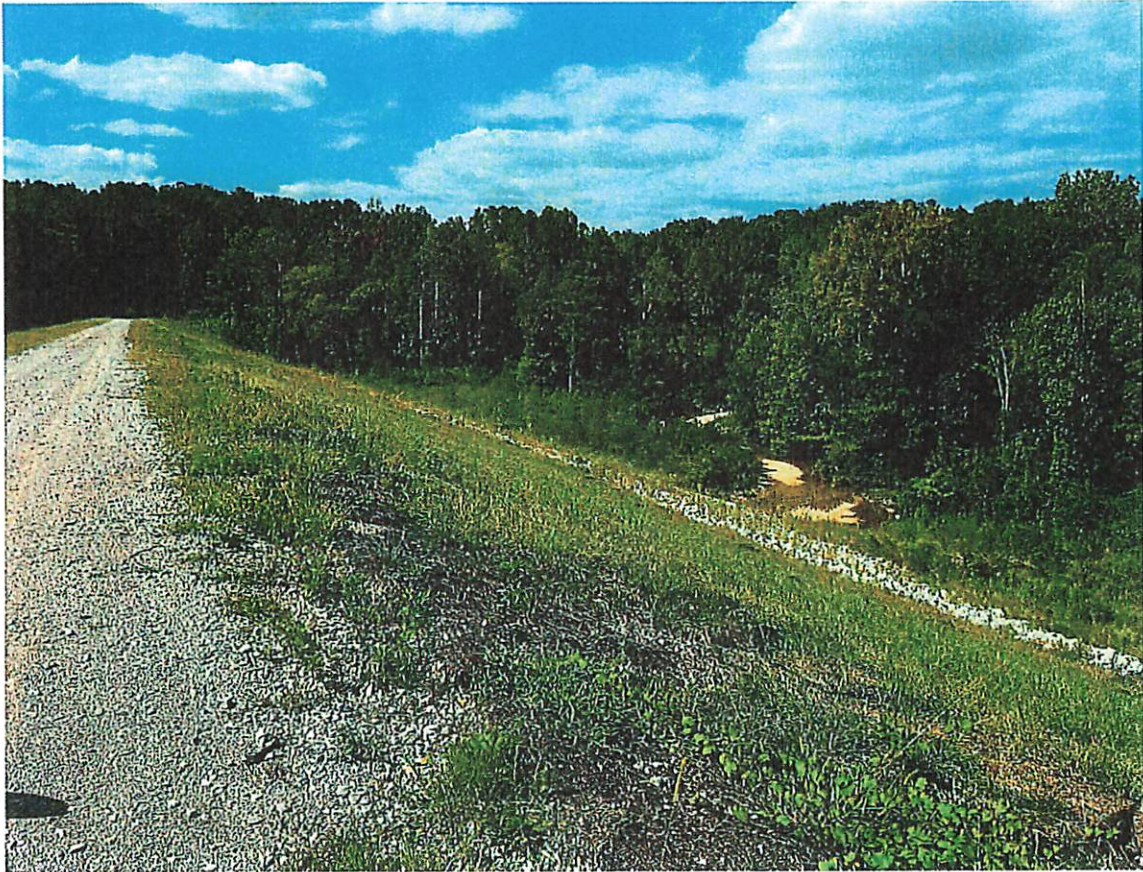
Upstream Dam Face Showing the Rip Rap Revetment and Five Mile Creek at the Tarrant Flood Mitigation Dam
